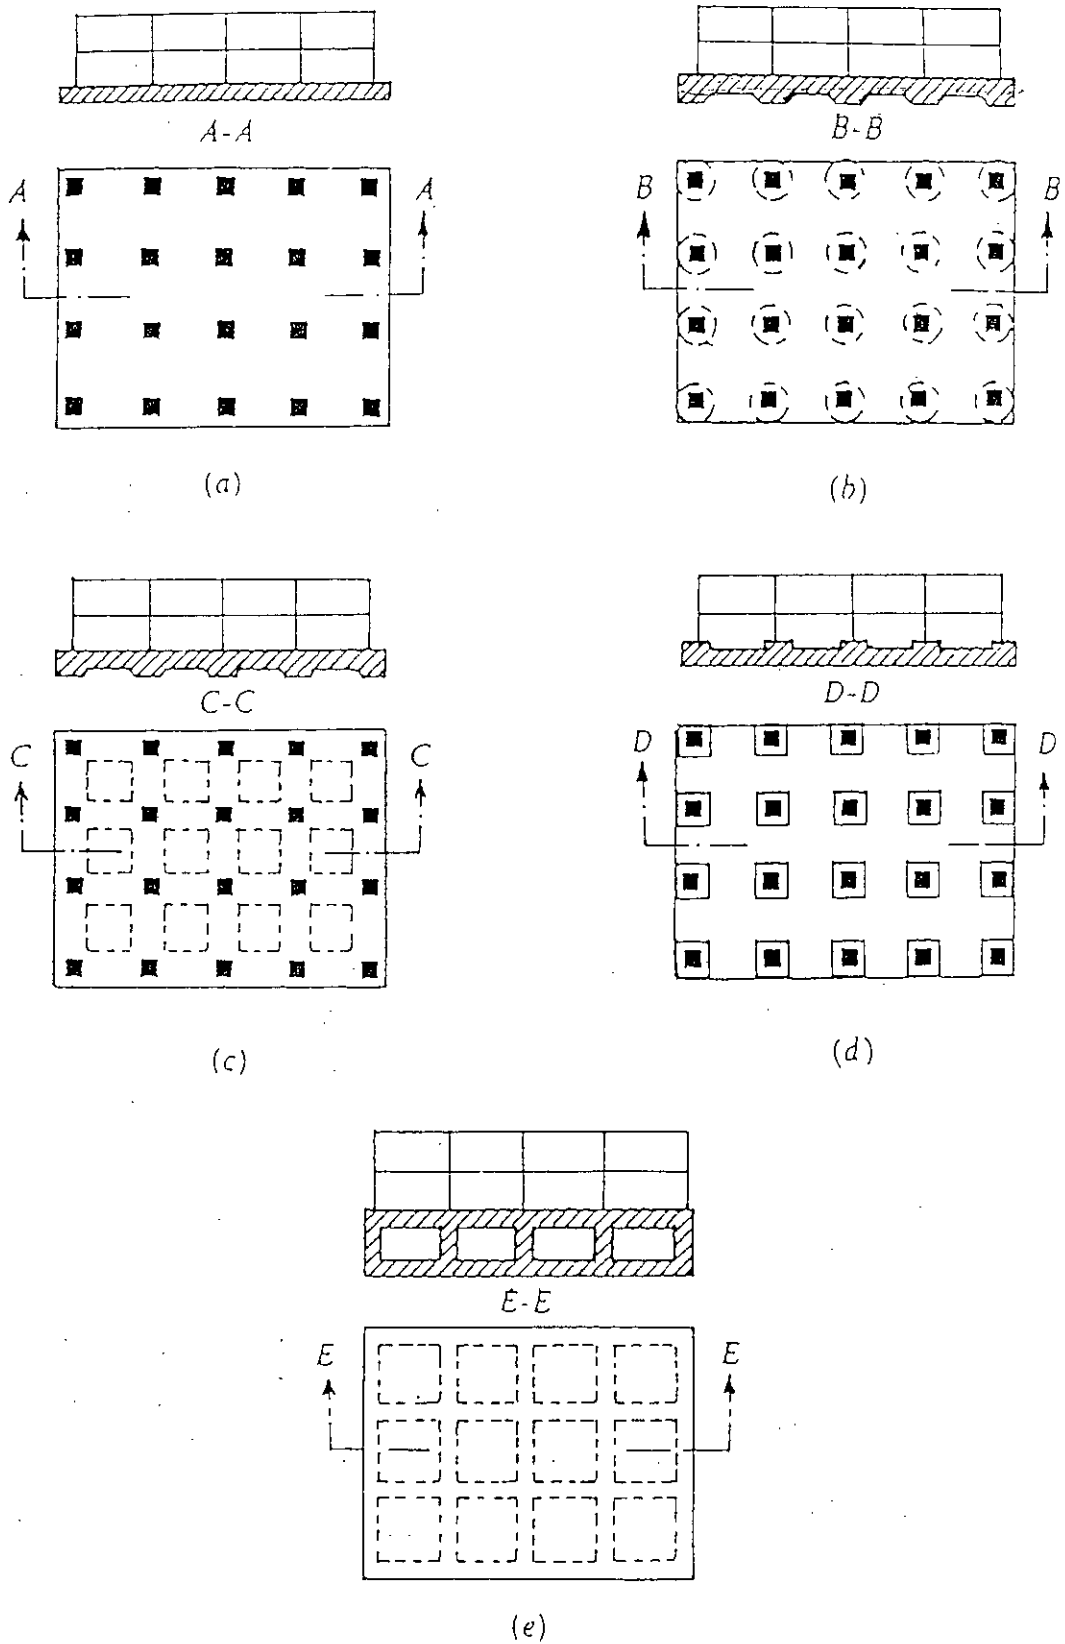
Common types of mat foundation : (a) flat plate ; (b) plate thickened under columns ; (c) waffle slab ; (d) plate with pedestals and (e) basement wall as part of mat.
